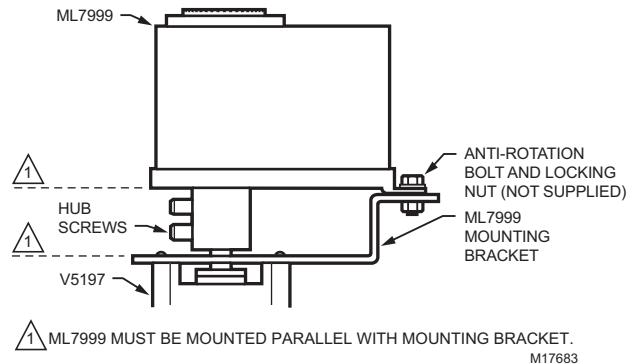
Mounting the ML7999 on the V5197 Valve.
